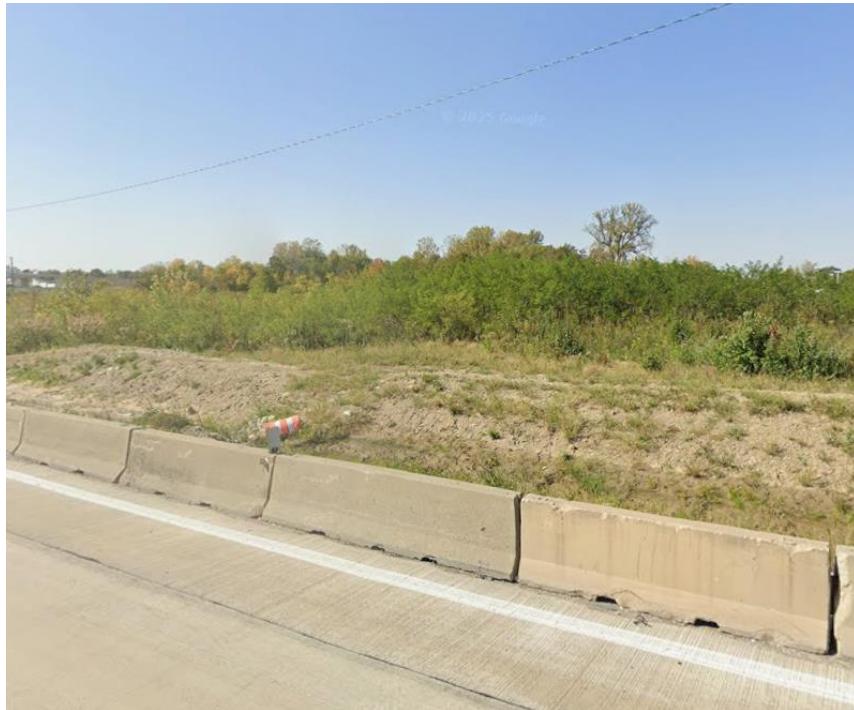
Subject Area Viewed from East (October 2024) – SB Traffic Exit Lane
